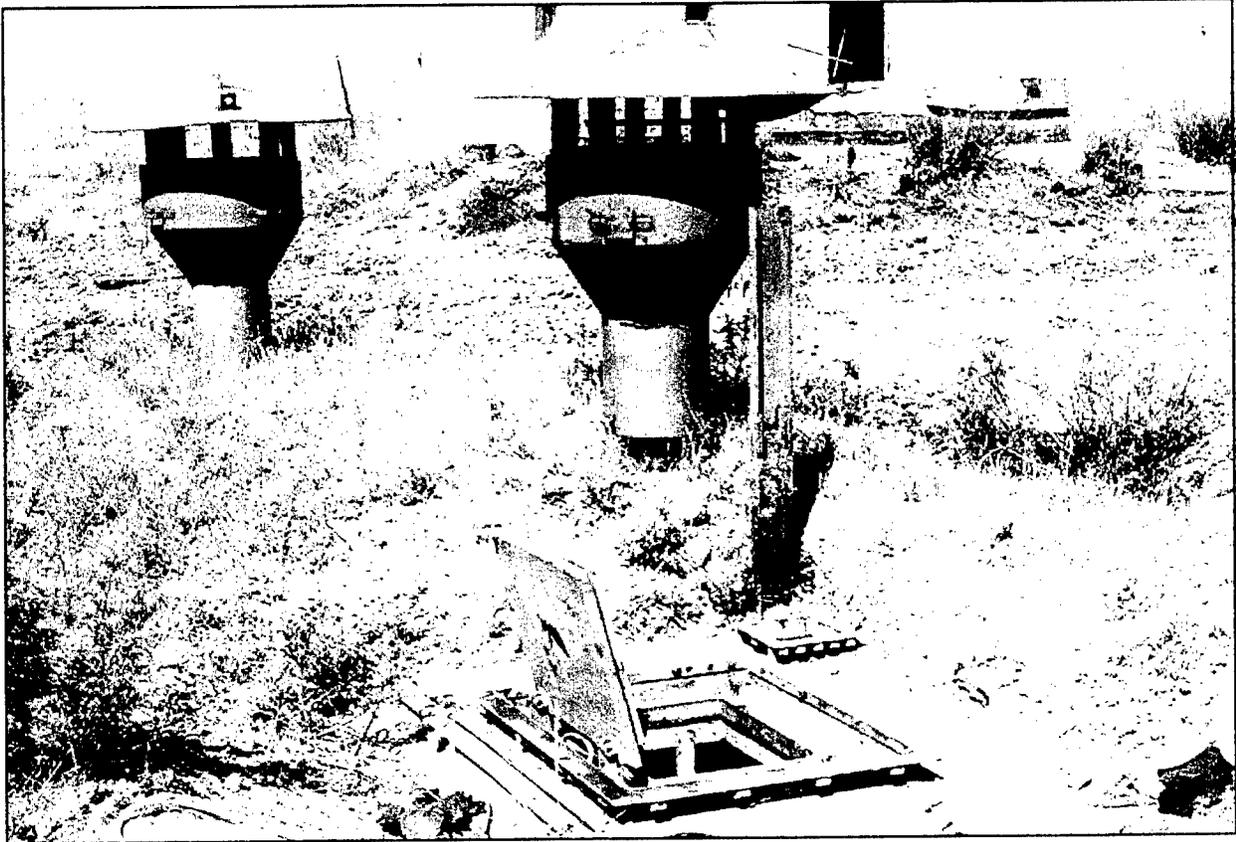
The ventilated underground chamber for access to the launch silo and cables. The transformer substation is in the background. Derzhavinsk, Regiment 2, Silo 4.
